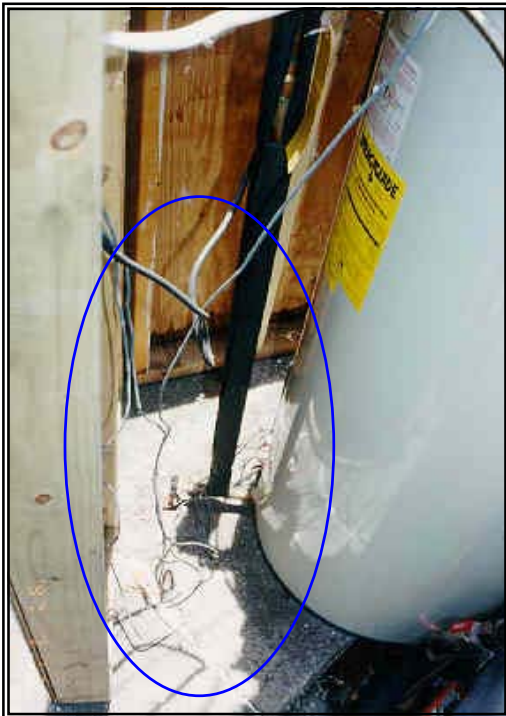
Extra sensor wiring left dangling on floor.
